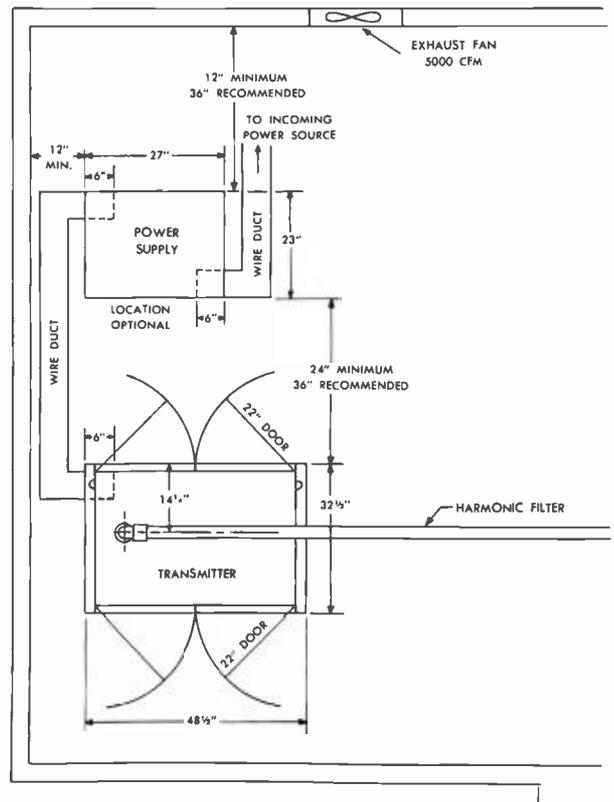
Floor plan layout for BTF-5 or BTF-10E transmitters.
